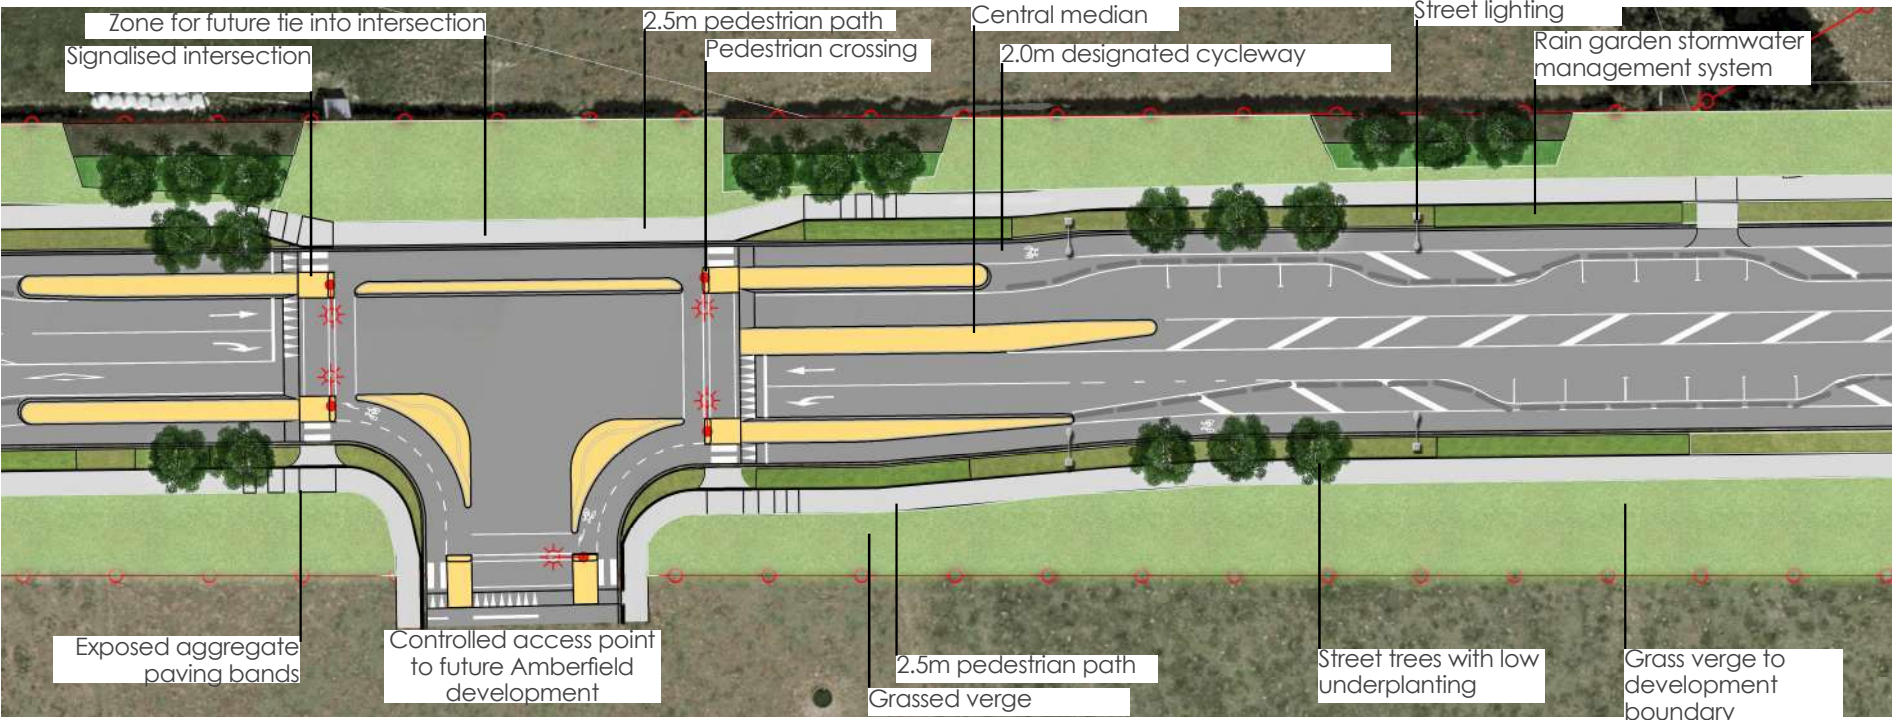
ILLUSTRATION PLAN VIEW OF PEACOCKE ROAD
